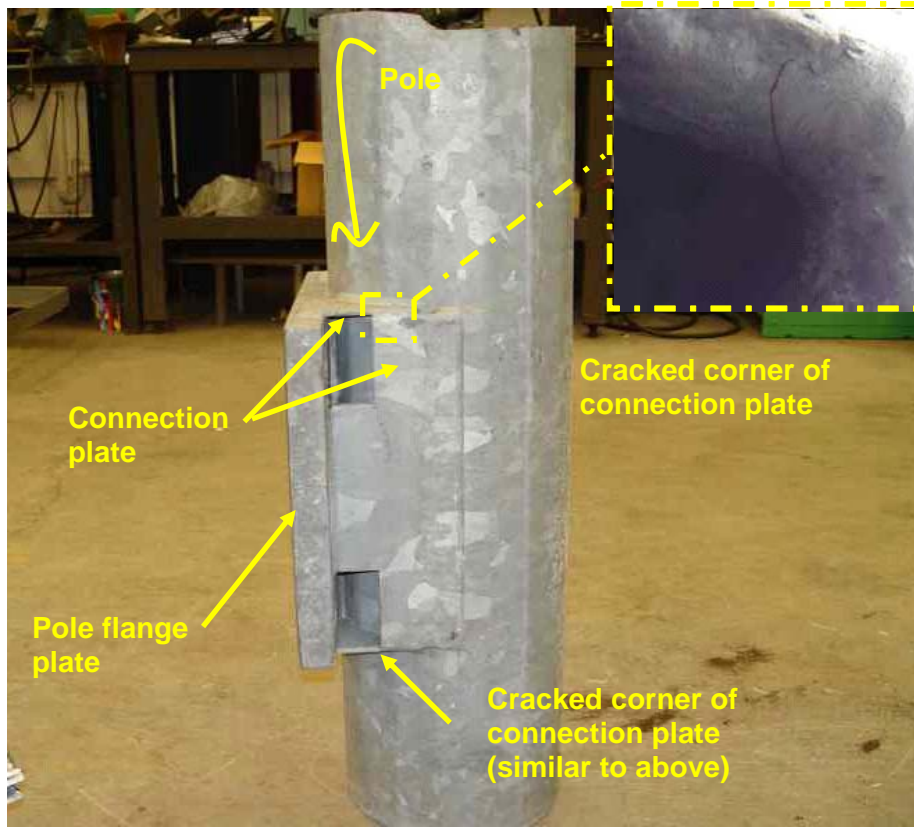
Cracked connection flange detail of the pole
